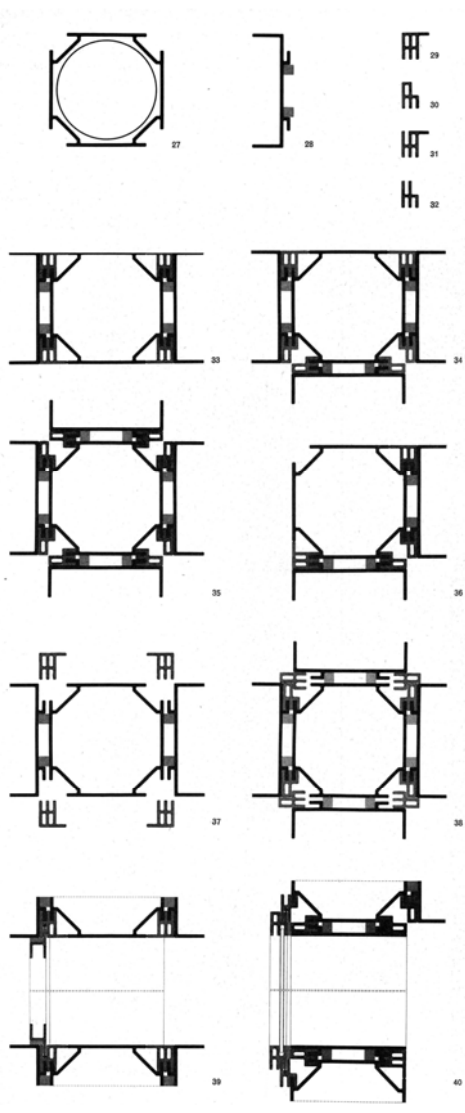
POST AND GIRT CUBE GROUPS EXTENDED A HALF MODULE INTO WALLS AND FLOORS
